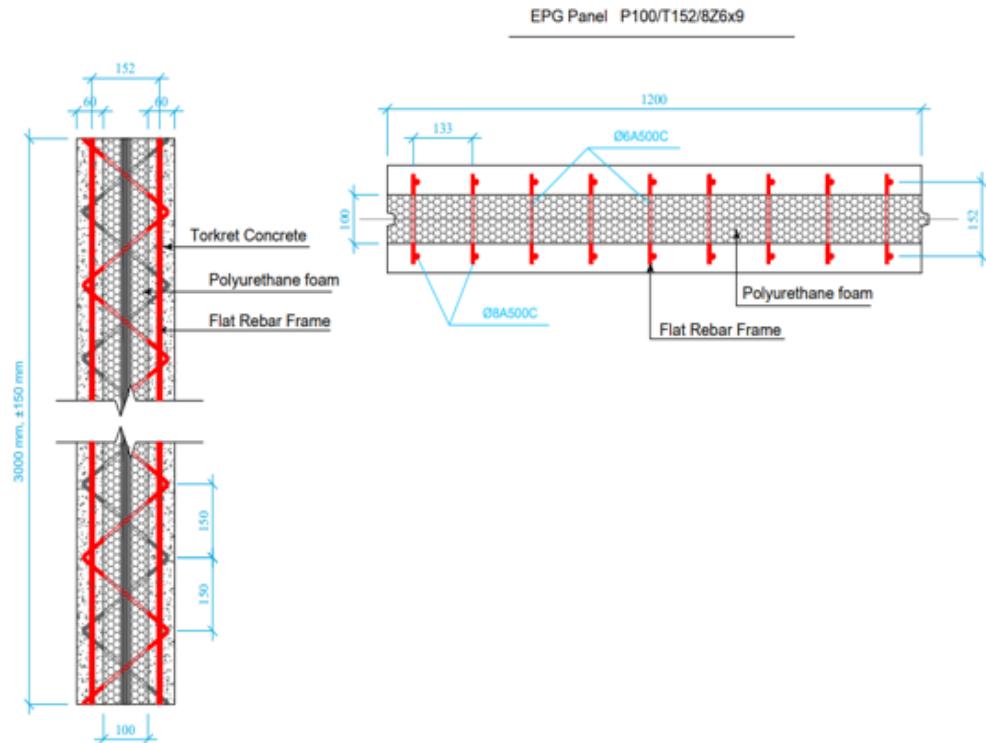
Transverse and longitudinal sections of three-layer sound - and thermal insulating panels
